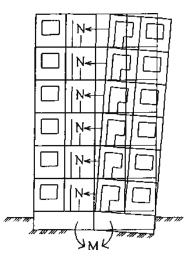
Building deformation behavior under tension strain of floor plates caused by foundation distortion.
